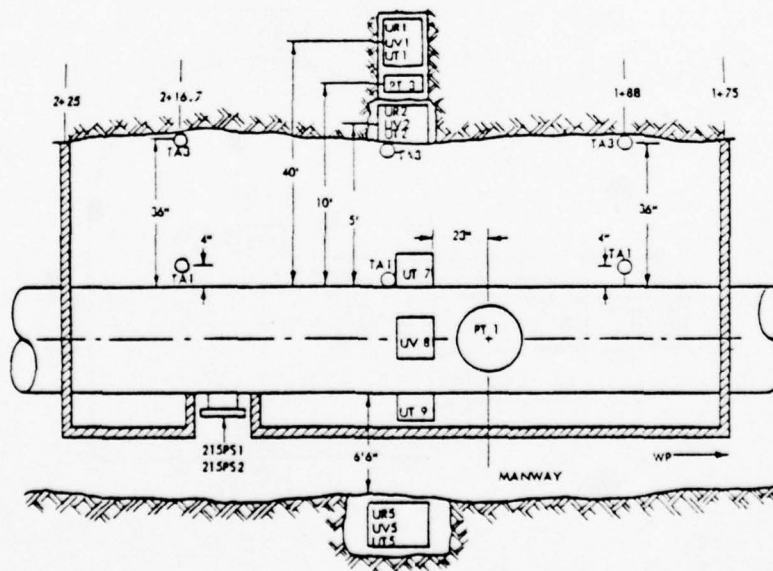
Plan view: Pressure and velocity gage installation in superlean grout, 175 feet to 225 feet. (POR 6389)
